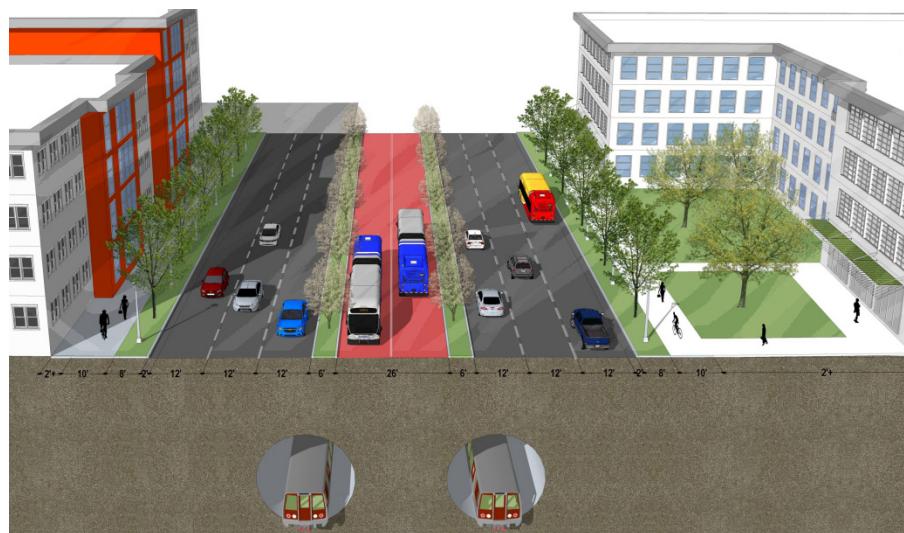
Alternative 4: Metrorail/BRT Hybrid – Underground, Typical Section (Yellow Line Extension)
